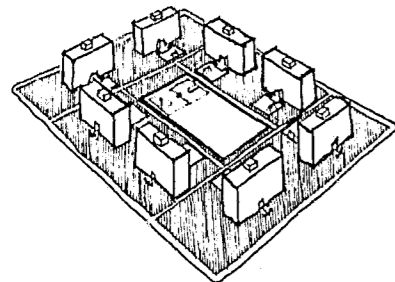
Housing project site plan in which teen play facilities have been centrally located so as to be related to all the buildings.
